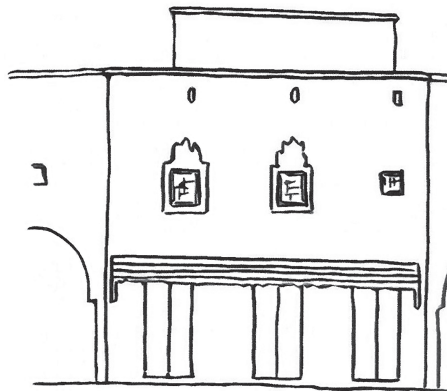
A modest courtyard house facade with commerce on the ground floor
